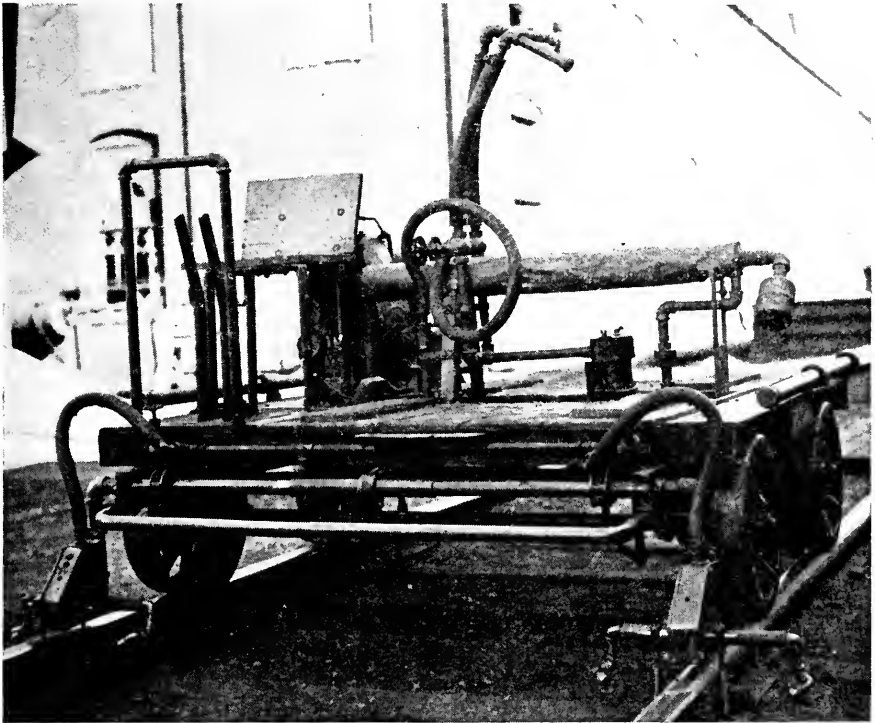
Rail Joint Spray Car—Nozzle in Spraying Position.
